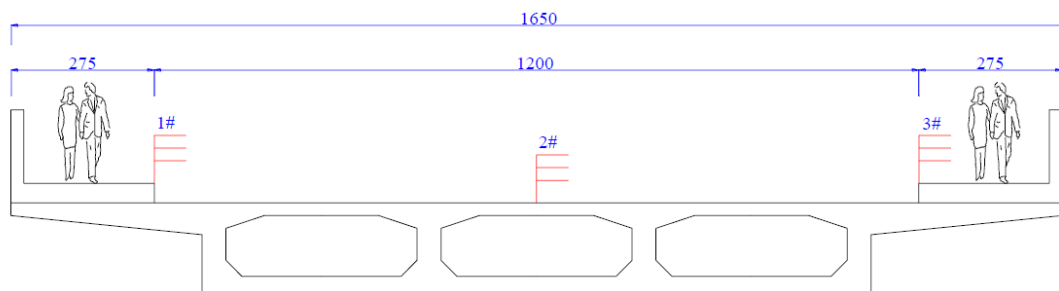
Horizontal layout diagram of bridge deck deflection measurement points
